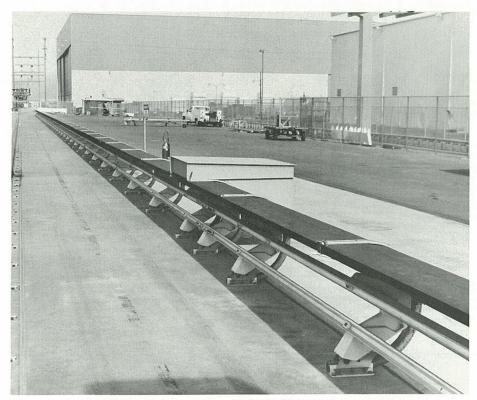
500-Foot Test Track, Chula Vista, California
